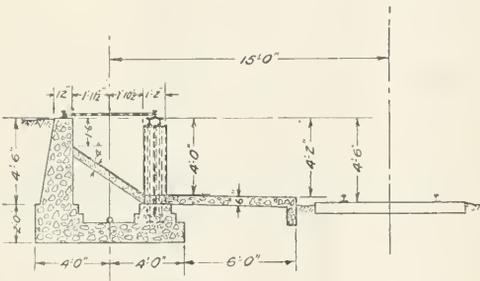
A Dry Pit Built by the Bangor & Aroostook
